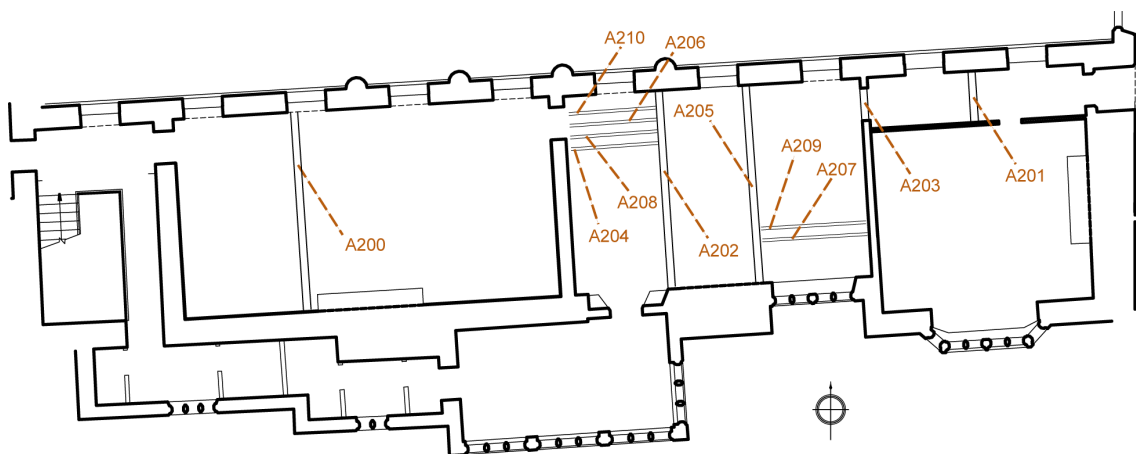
First-floor plan of the South range, showing the locations of samples APT-A200–10
